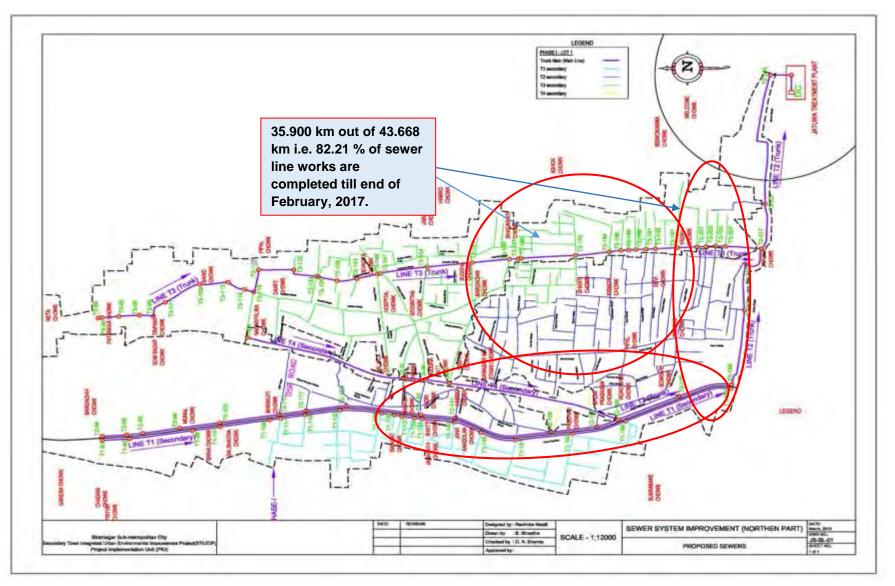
PROPOSED SEWER LINES IN BSMC
